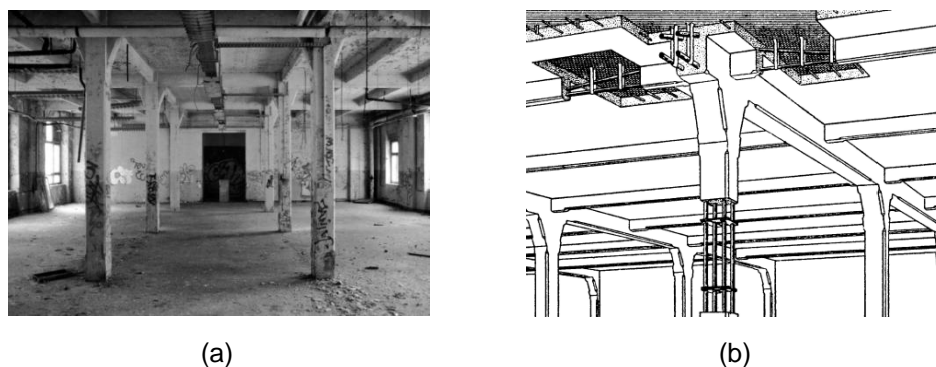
Printer shop at Leipzig, Germany: (a) The interior of the first floor (b) Hennebique’s drawing showing the reinforcement with the bars of sheet-iron [34]
